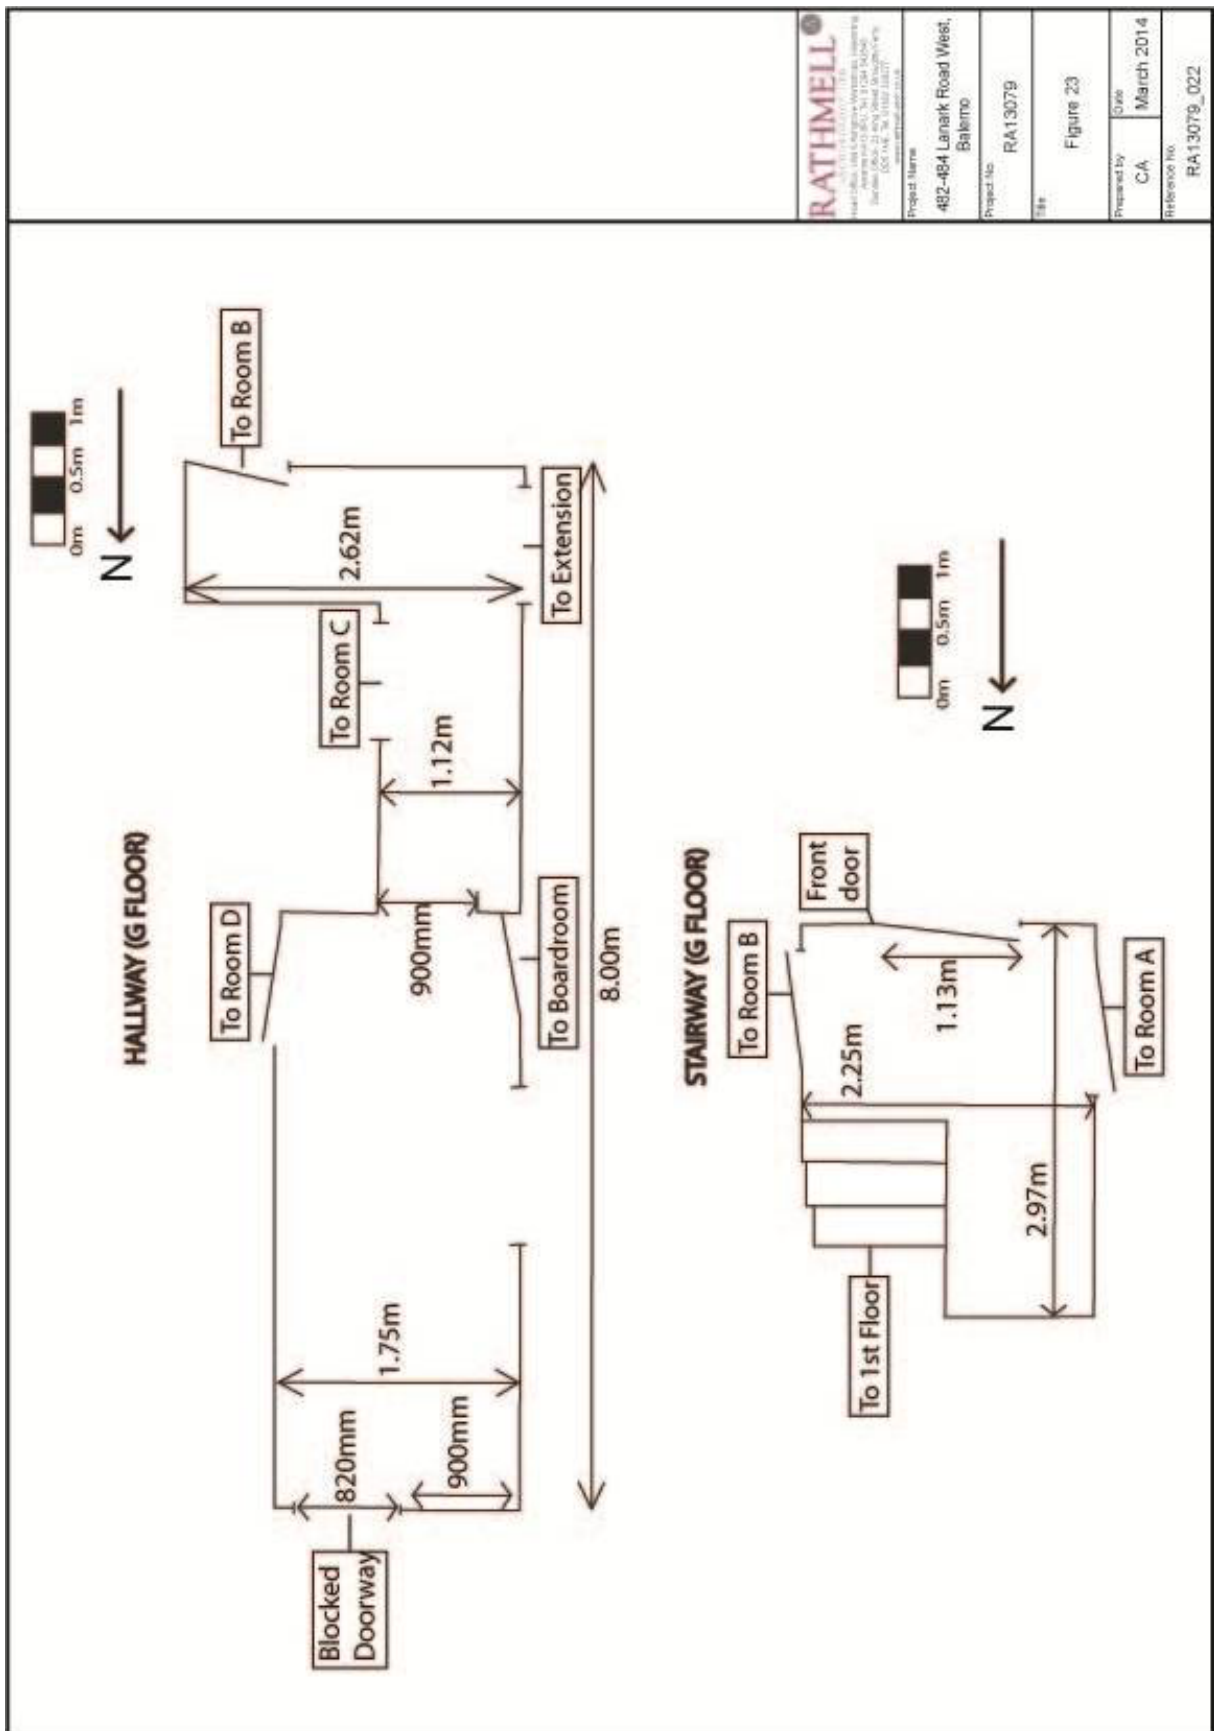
Building A - Plan of stairway/hallway on ground floor, Building B – Plan of hallway.
